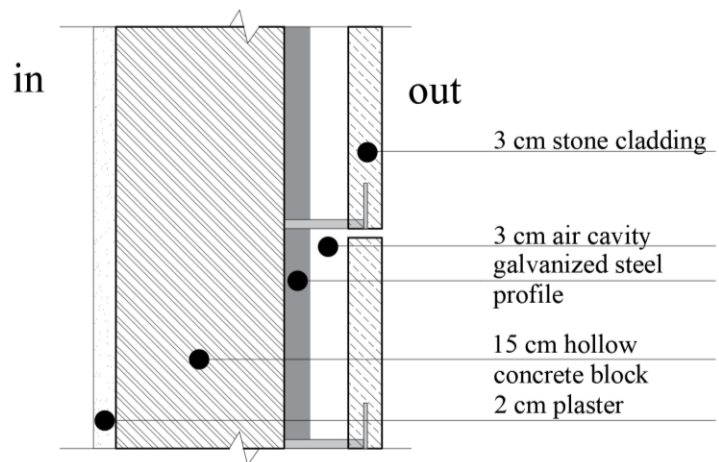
The detail and application of mechanical stone cladding in Hebron
